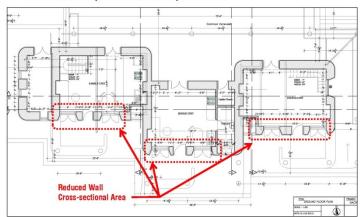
Overall plan of the three prototype buildings, showing the sections on the south facades where many openings have reduced the bearing area of the walls
